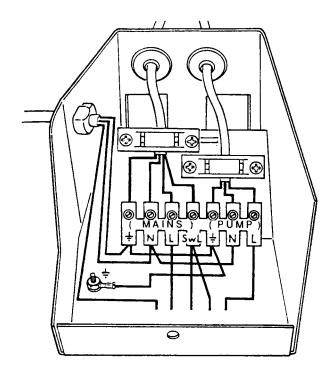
WIRING THE BOILER FOR A FULLY PUMPED SYSTEM
